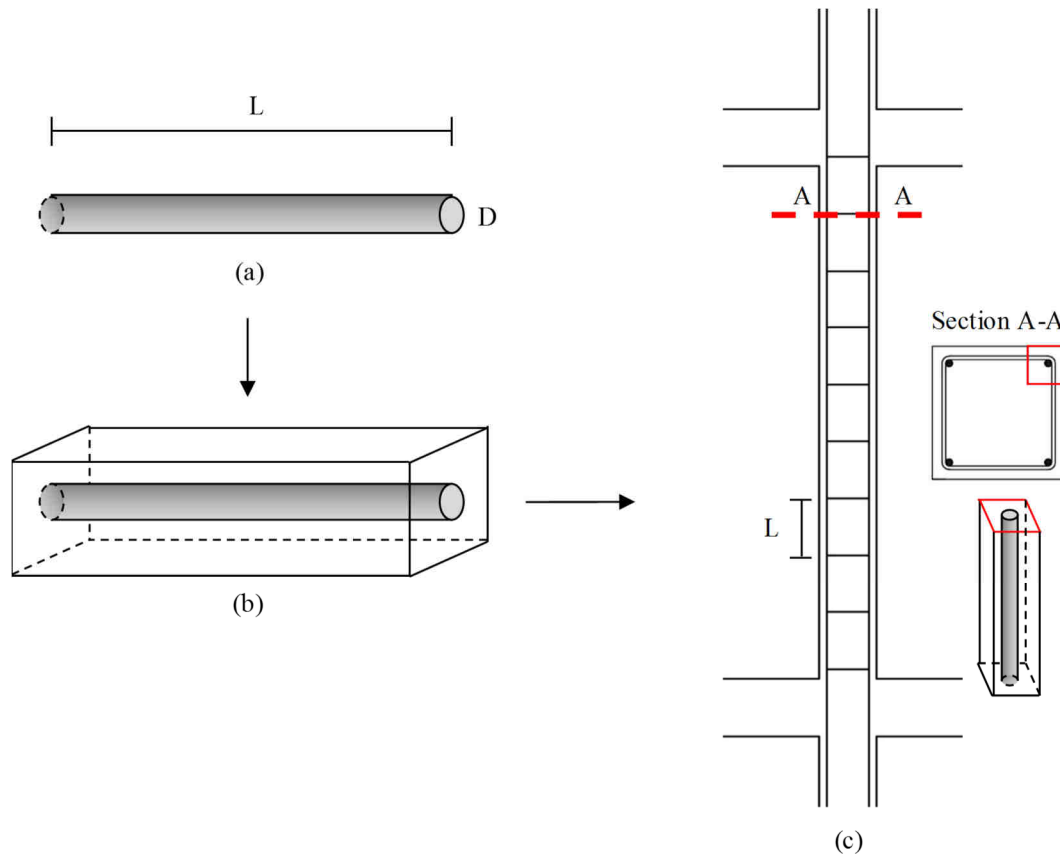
From the bare bars behaviour to RC elements: (a) bare bar, (b) bar in a simple RC element and (c) RC column.
